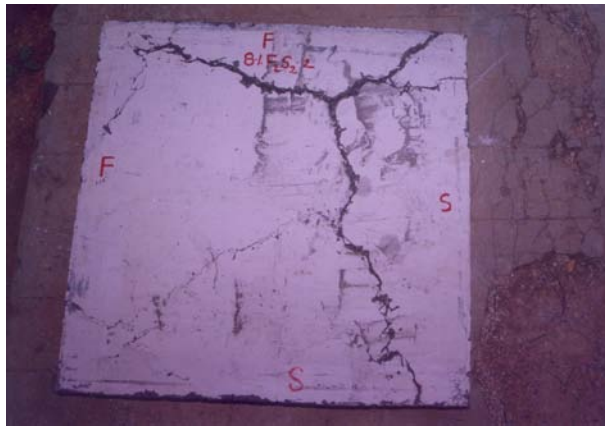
Failed specimen depicting crack pattern of SIFCON-8% fibre volume slab specimen
